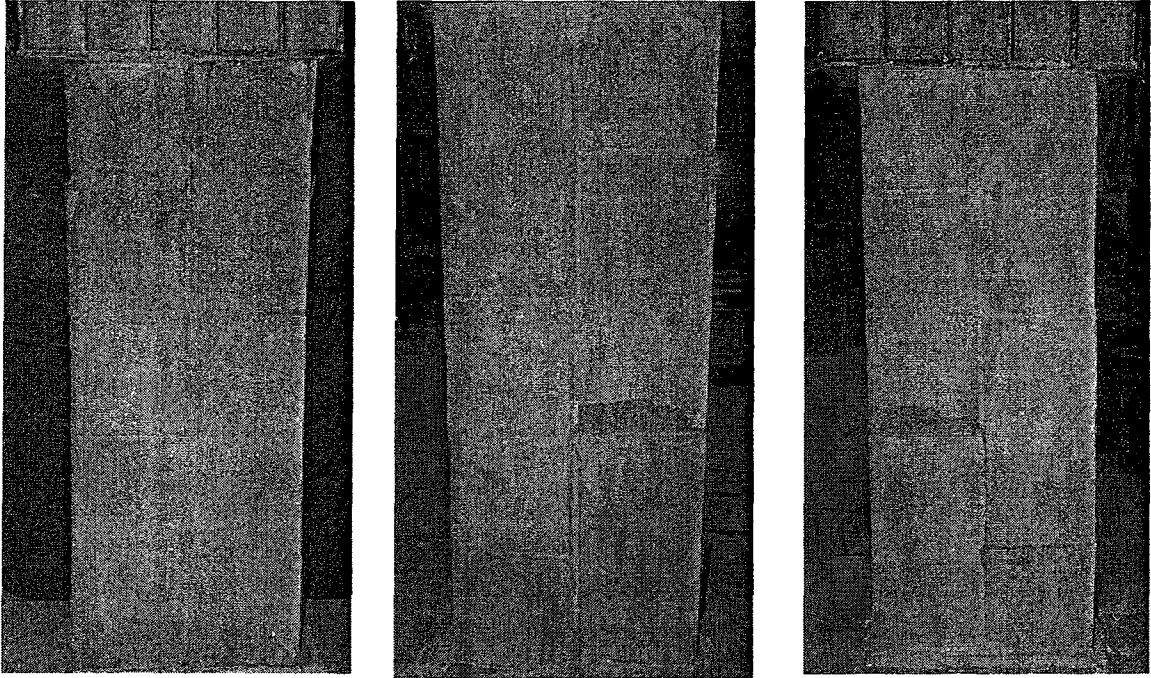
Compressive masonry prisms loaded parallel to their bed joints after failure.
